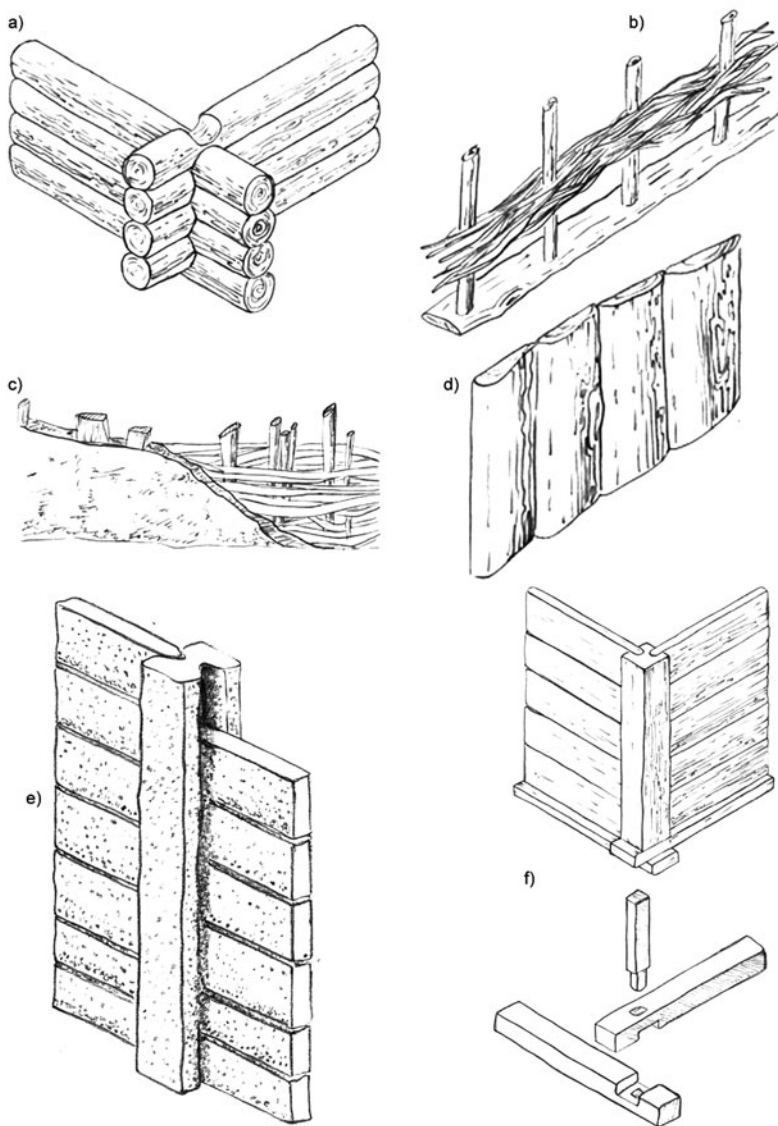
Different kinds of lake-dwelling walls: a) Block-construction; b) Wattle; c) Wattle and daub; d) Split roundwood; e) Plank-pillar; f) Plank pillar with mortise and tenon joints. (Drawings: Olenka Dmytryk)
